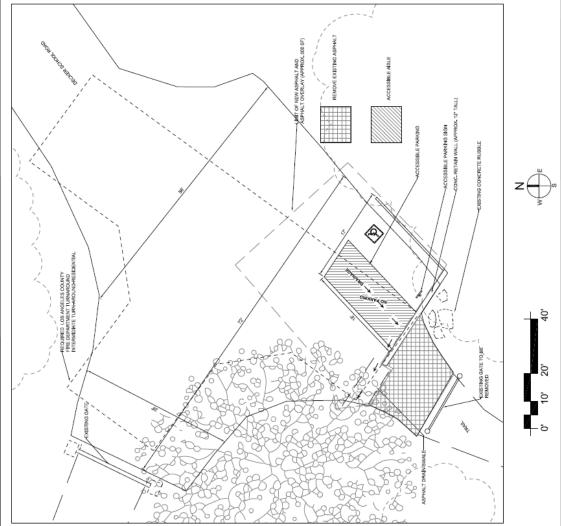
Permit 4-10-036 Trailhead Parking Area Plans
